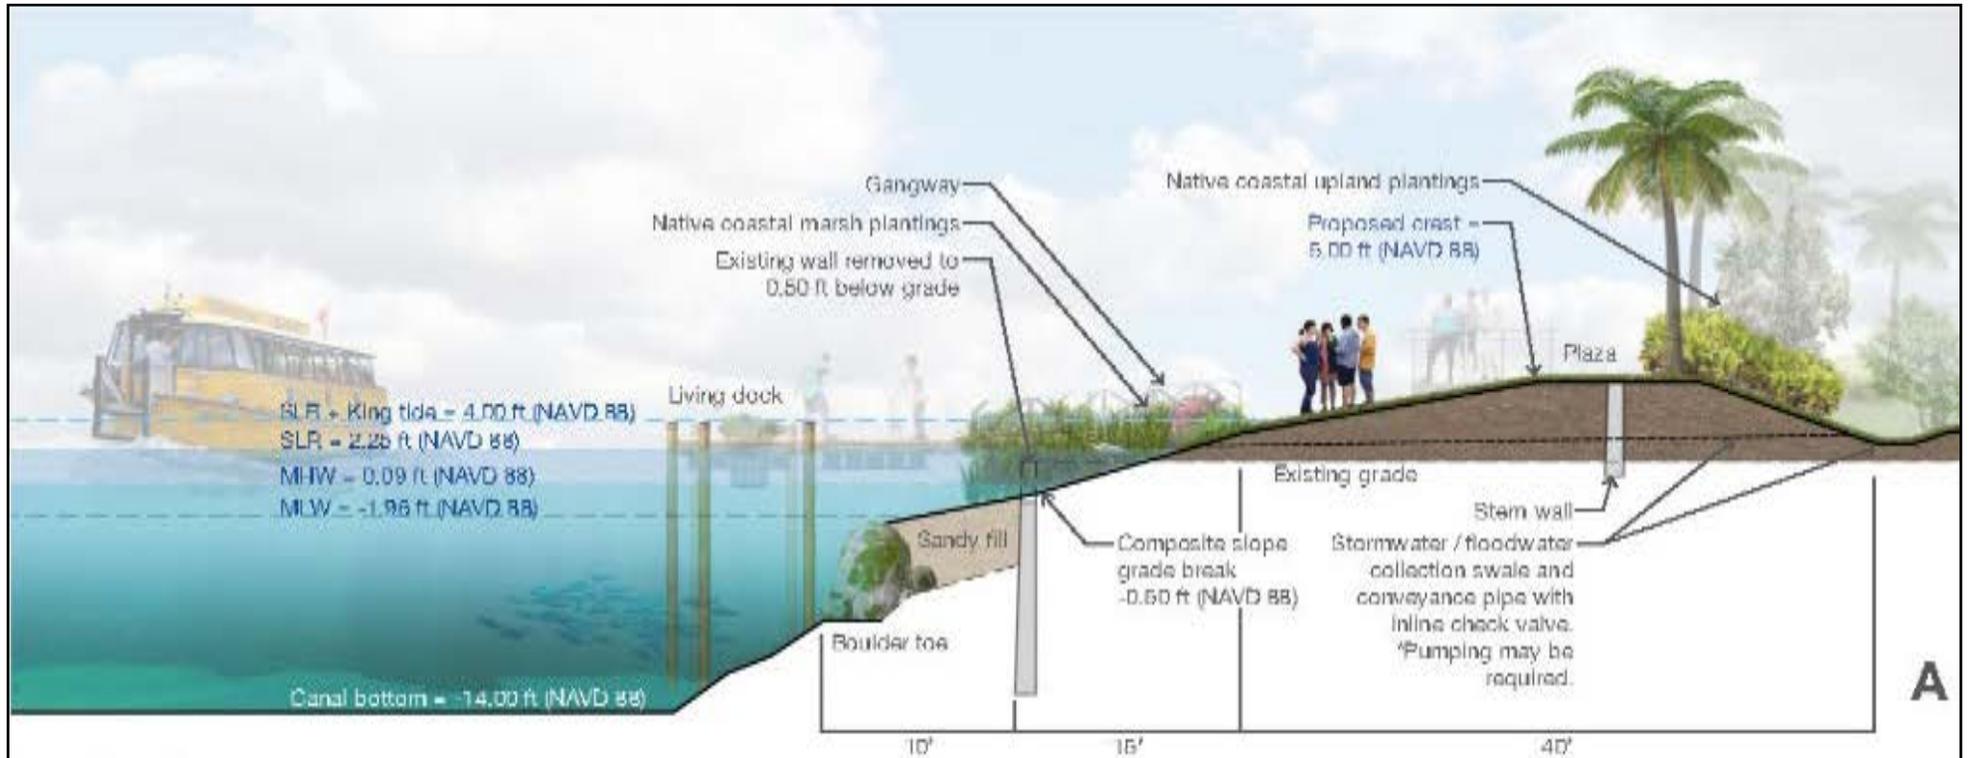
Deep Water, Low Wake - Cross Section View showing upland berm with a stem wall, shoreline intertidal vegetation and the boulder toe and floating/living dock amenity.
